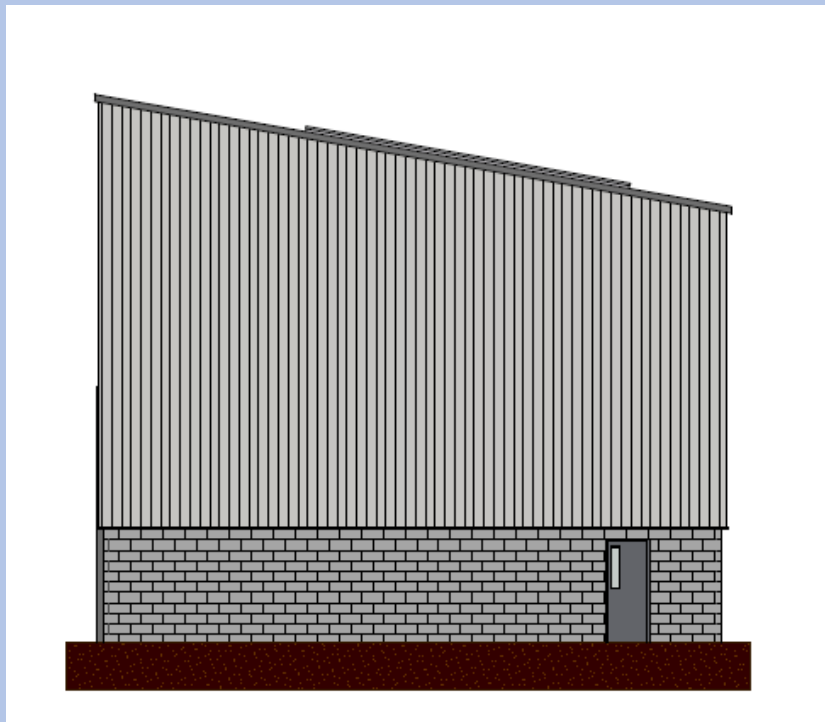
Zone 1. Goods in Building- Right side elevation facing west towards Edenaveys Road (Image not to scale).
